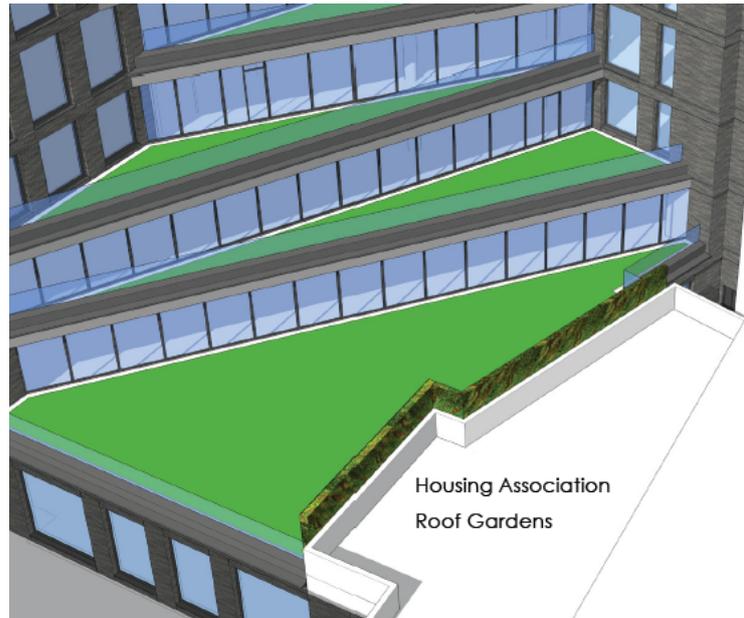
CGI of proposed first floor green roof adjacent to communal roof terrace
